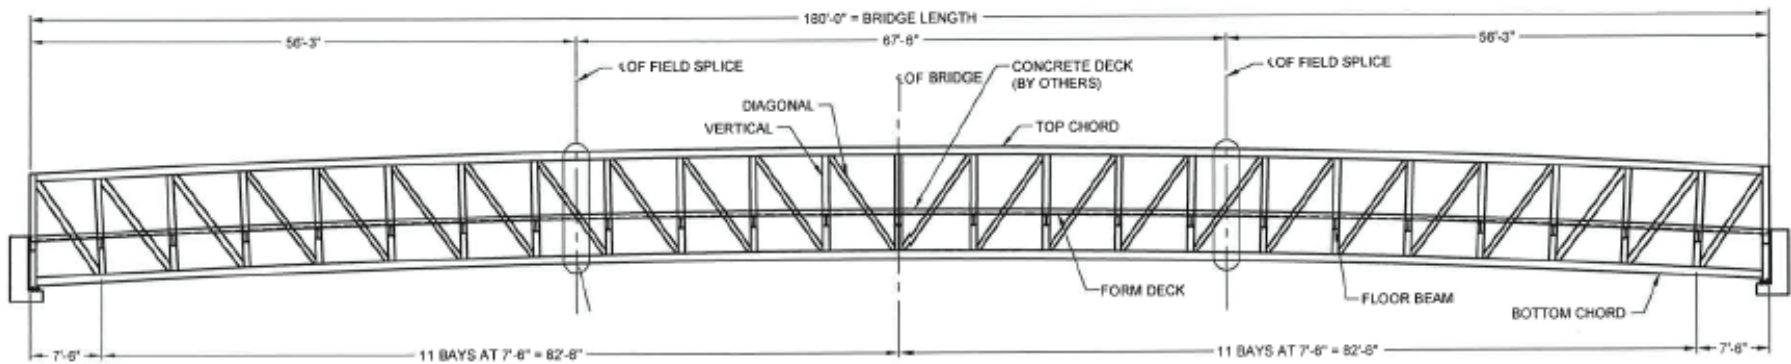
# Prefabricated Bridge Plan for McDade Trail Crossing of Bushkill Creek. A clear-span width of 180' is provided.
